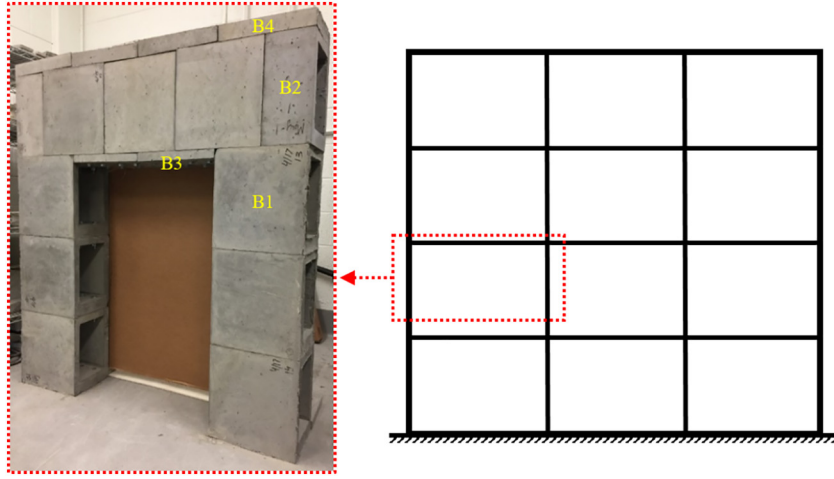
Demonstration of reconfigurability: Reusing the blocks from the footbridge to assemble a part of a building frame.
